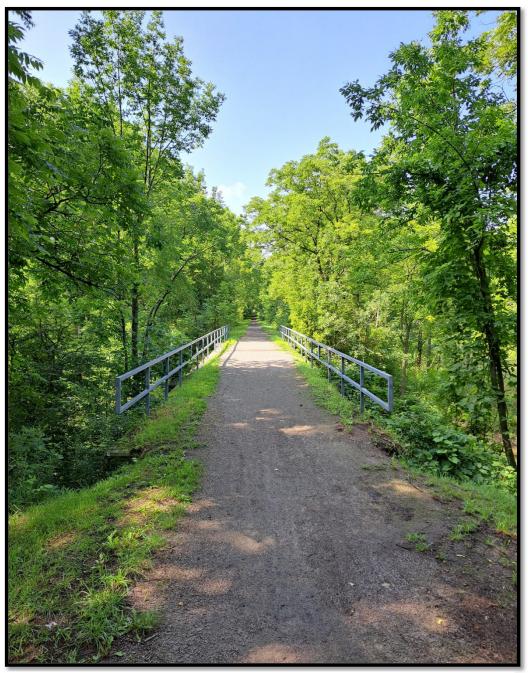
Chippawa Trail bridge over Twenty Mile Creek
